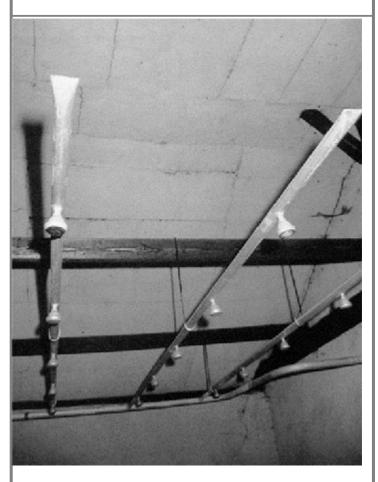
Water pipe system with shower heads in the disinfestation wing of building BW 5b. These water pipes have no connection; they terminate in the ventilation outlets. See Fig. 19.
